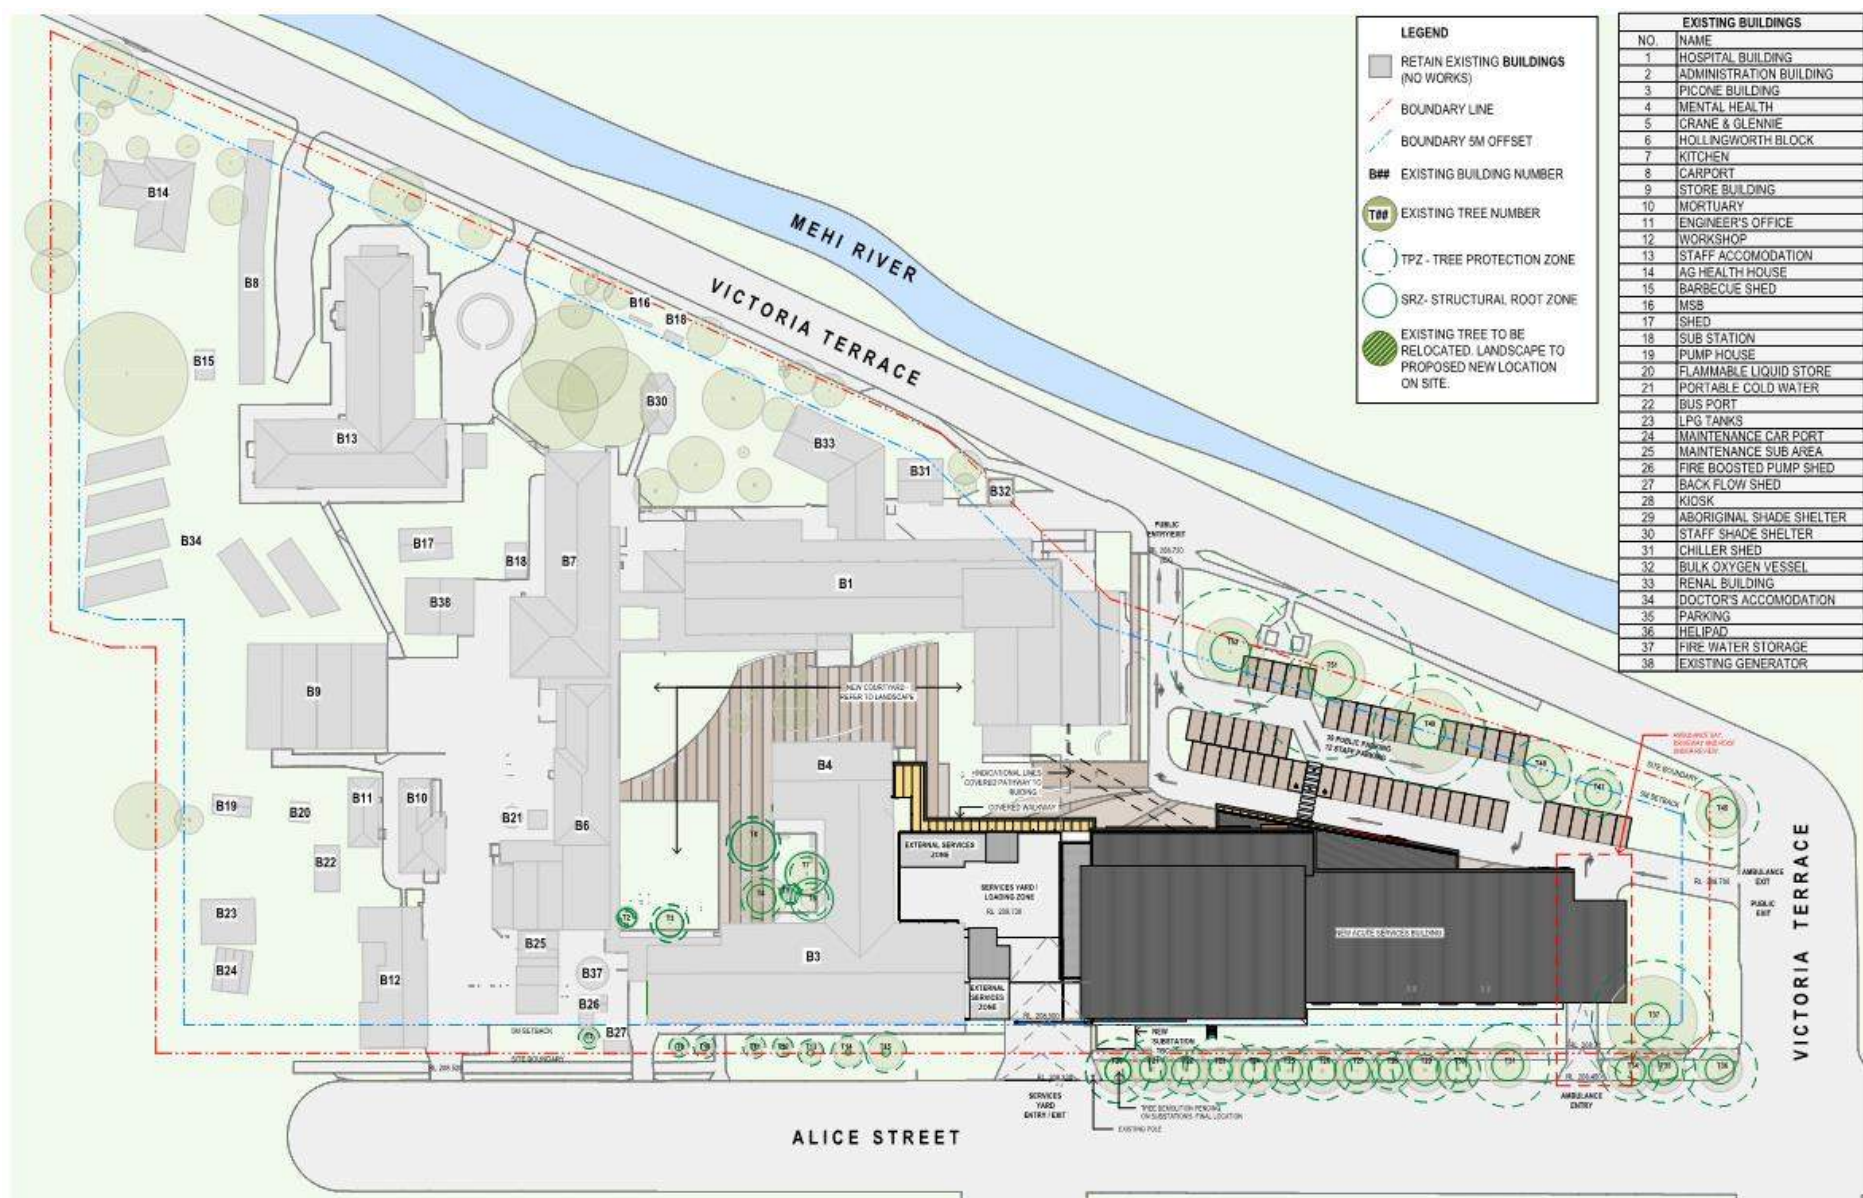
Site Plan and Building Numbers (STH, REV F - 8/09/2023)
